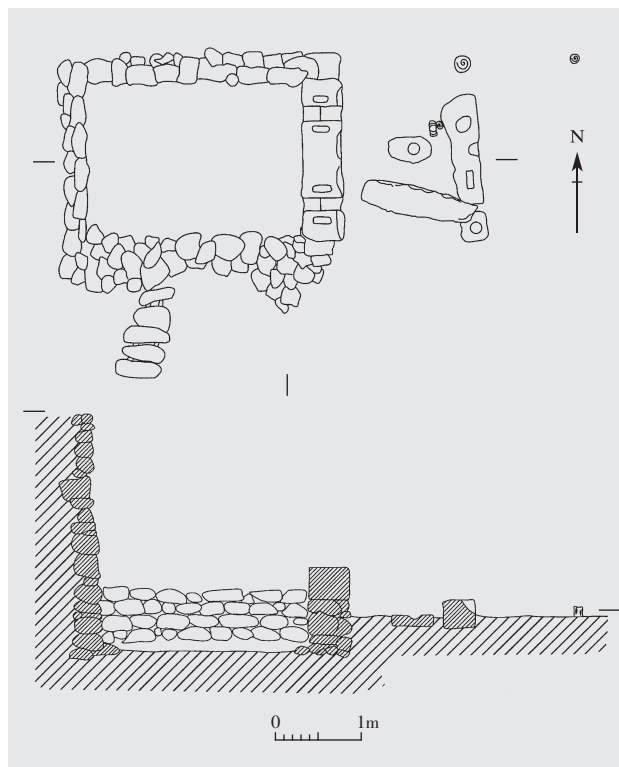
The plan and section of trip hammer 4 at Zhouling Village.
